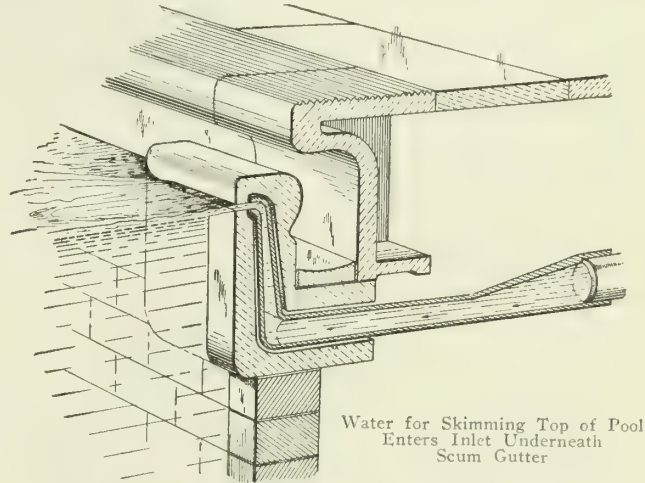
SKIMMING INLET UNIT, DESIGN No. 6250
